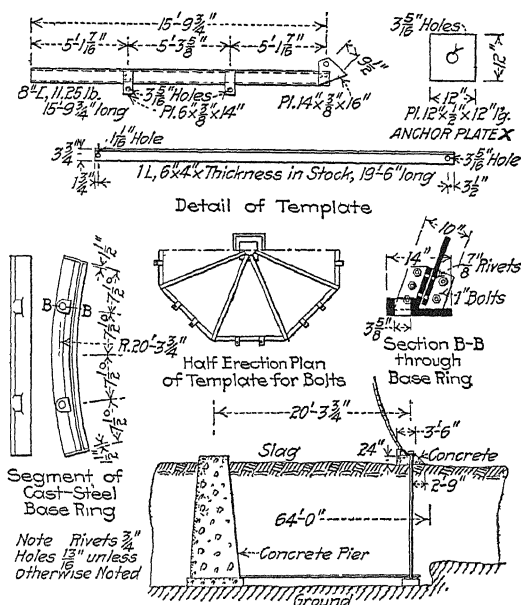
DETAILS OF SLAG FOUNDATION FOR CHIMNEY OF CALUMET & ARIZONA MINING CO., DOUGLAS.
